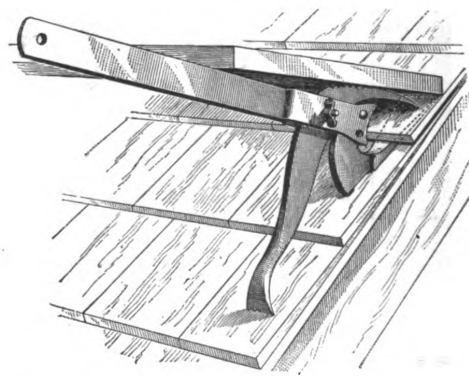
Arm of Ladder Bracket used as Roof Bracket
